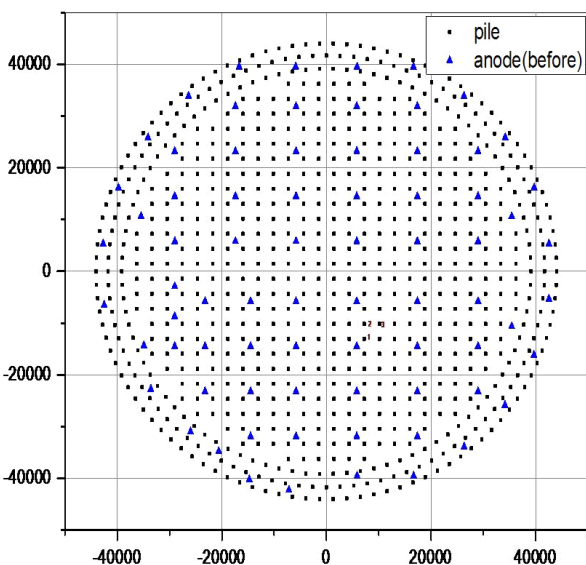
Plan view of steel piles and anodes in the FEM model (unit: mm).
